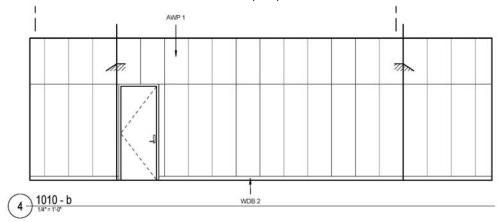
Auditorium Interior Elevation - North Wall (NTS)
